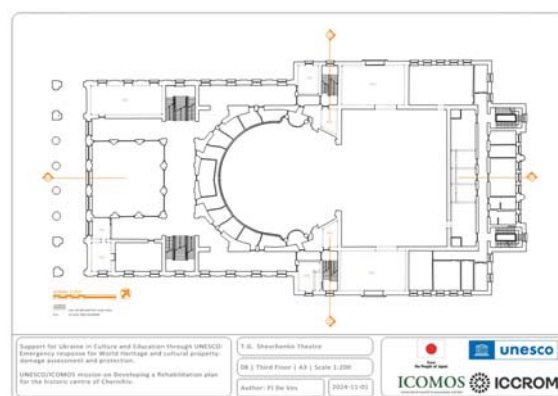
Deliverable: Drawing 08 – Plan of 3rd floor – Scale 1:200
